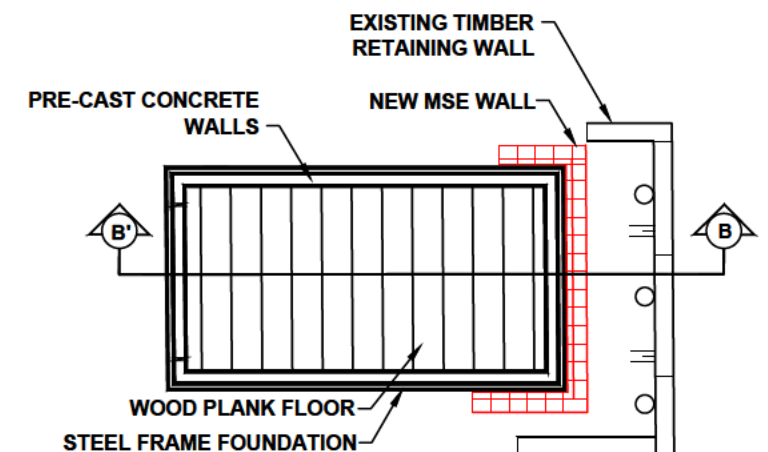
D: PROPOSED BOATHOUSE AND MSE WALL PLAN (B-B')
